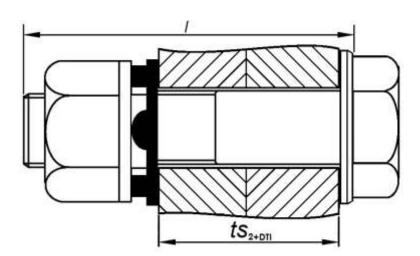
DTI under nut with nut face washer and chamfered washer under bolt head.
